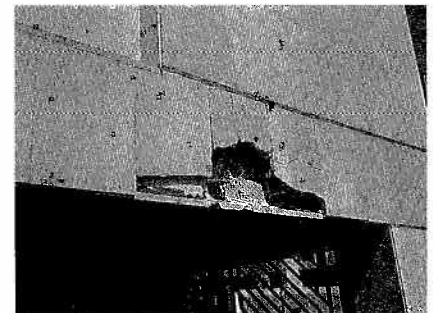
Shrapnel damage to marble facade of studio apartment complex at Al Fintas
